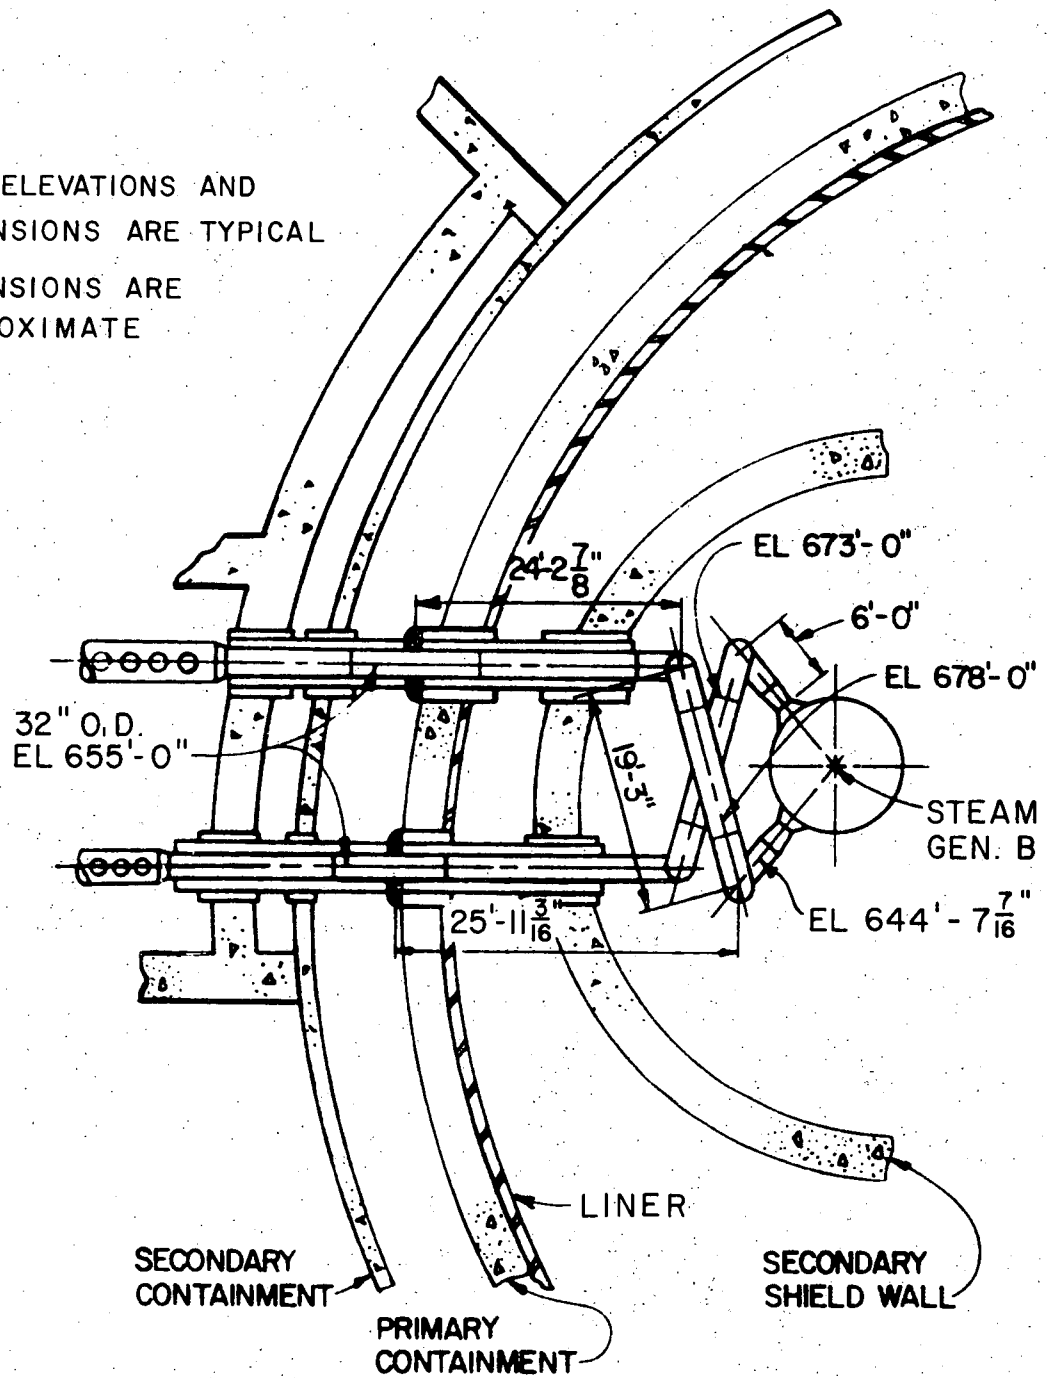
TYPICAL MAIN STEAM PIPING LAYOUT INSIDE CONTAINMENT
